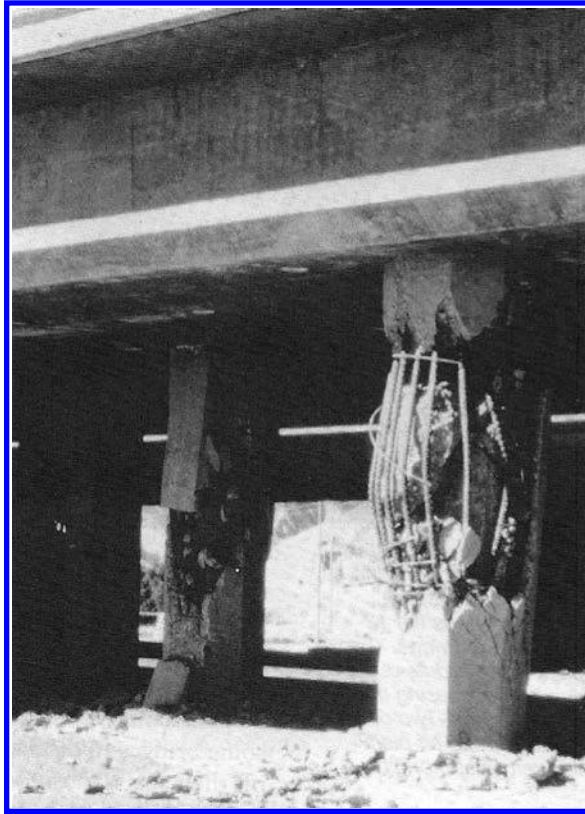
Shear failure of concrete bridge columns in the February 8, 1971, M 6.6 San Fernando (California) earthquake. The dramatic failure was typical of many bridge failures in October 4, 1994, M 6.4 Northridge (California) earthquake.
